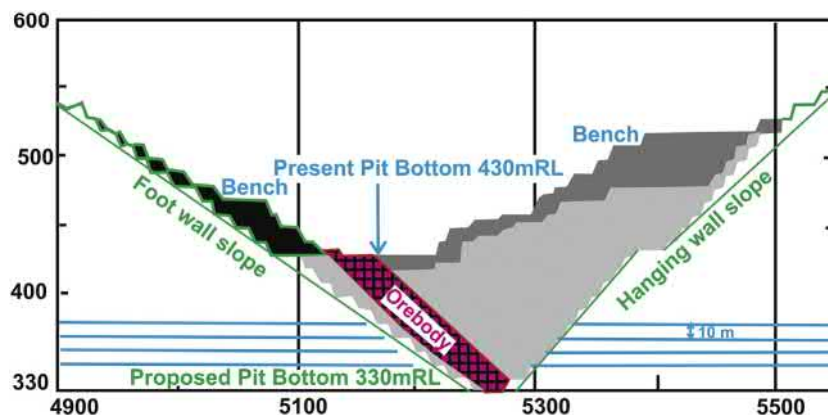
Schematic projection of open pit benches, footwall and hanging wall slope angle at technical stability and safety of miners and machineries. It depicts the ultimate pit bottom in surface mining beyond which ore production will be uneconomic. Mining will continue by underground methods if orebody persists in depth.
